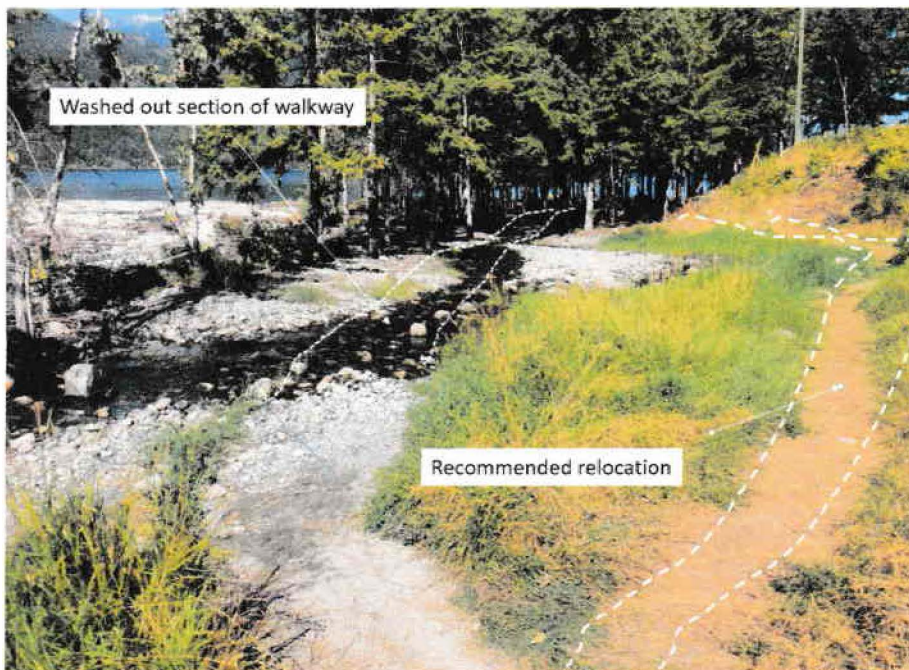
Site 1 – Walkway Flooding and Erosion August 25, 2020
